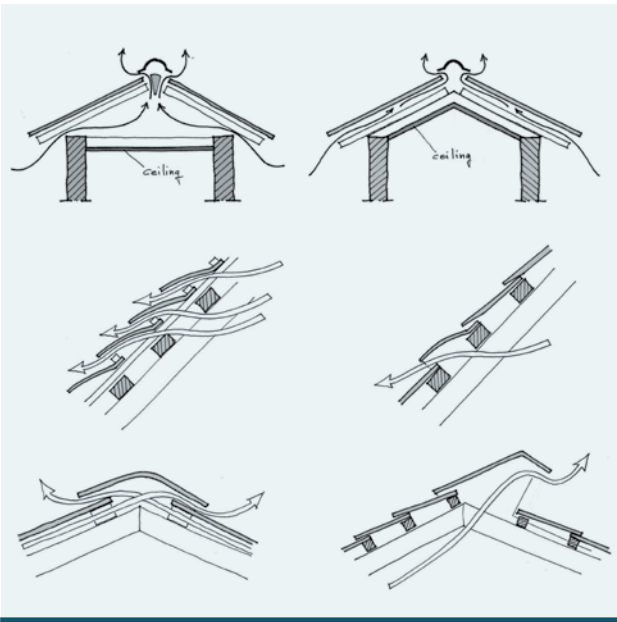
ALUMINIUM LAYER BETWEEN THE ROOF AND THE CEILING
